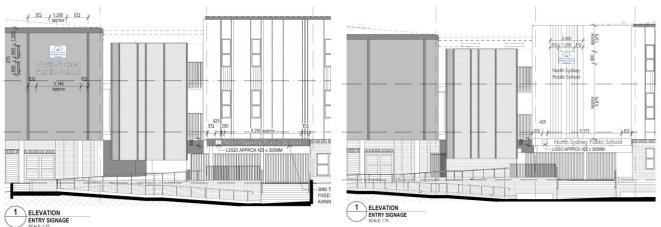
Extract of the previously proposed elevation entry signage on Building I (Source: Fulton Trotter)
